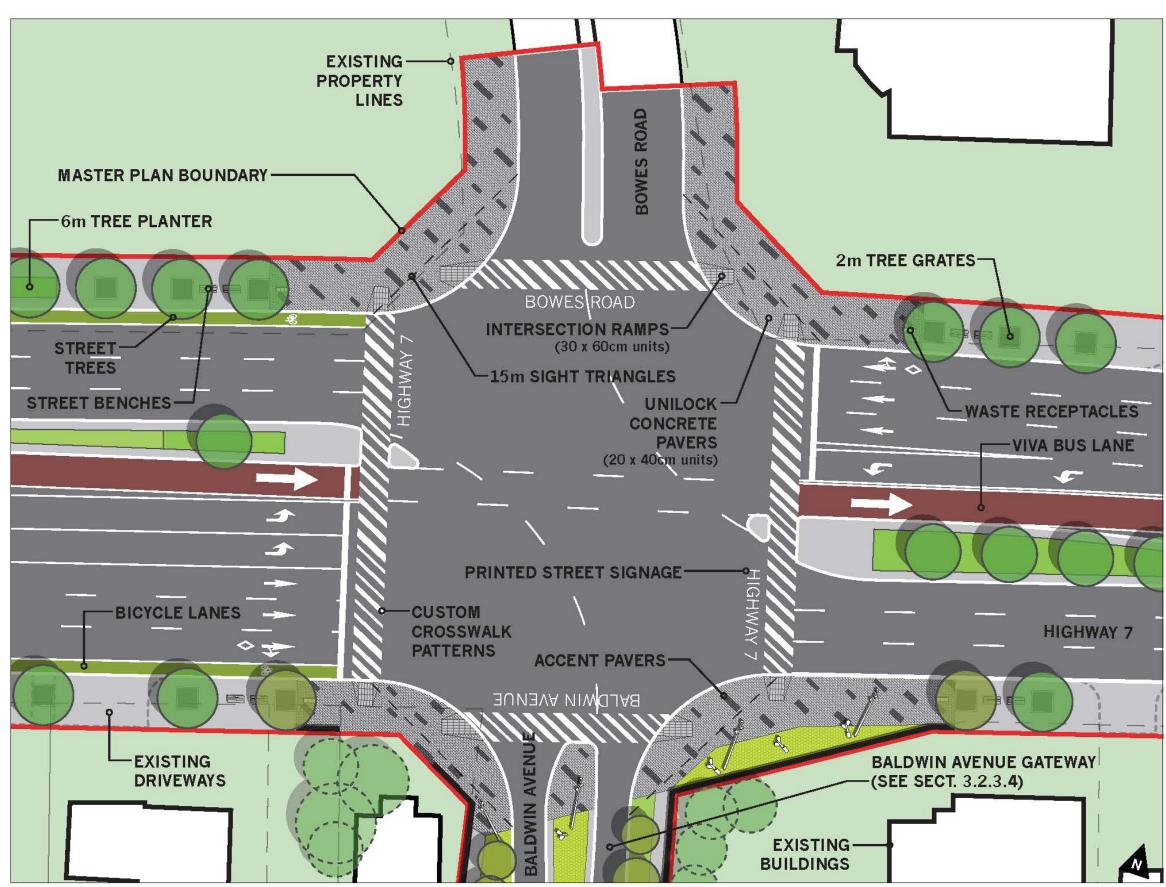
Highway 7 & Baldwin Avenue Intersection streetscape concept.
